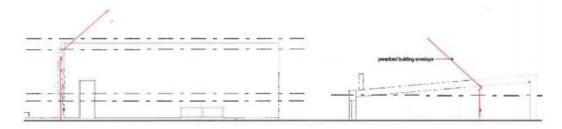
The north and south elevations of the proposal showing the building envelope drawn in red.
